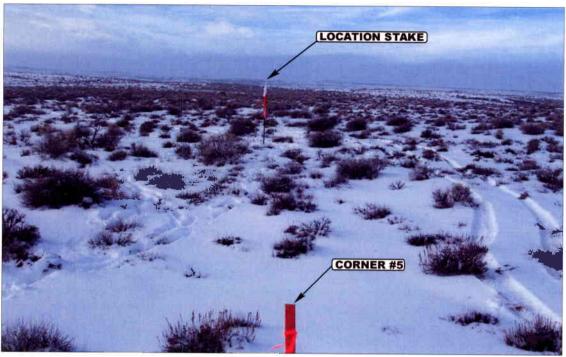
PHOTO: VIEW FROM LOCATION STAKE TO CORNER #5
